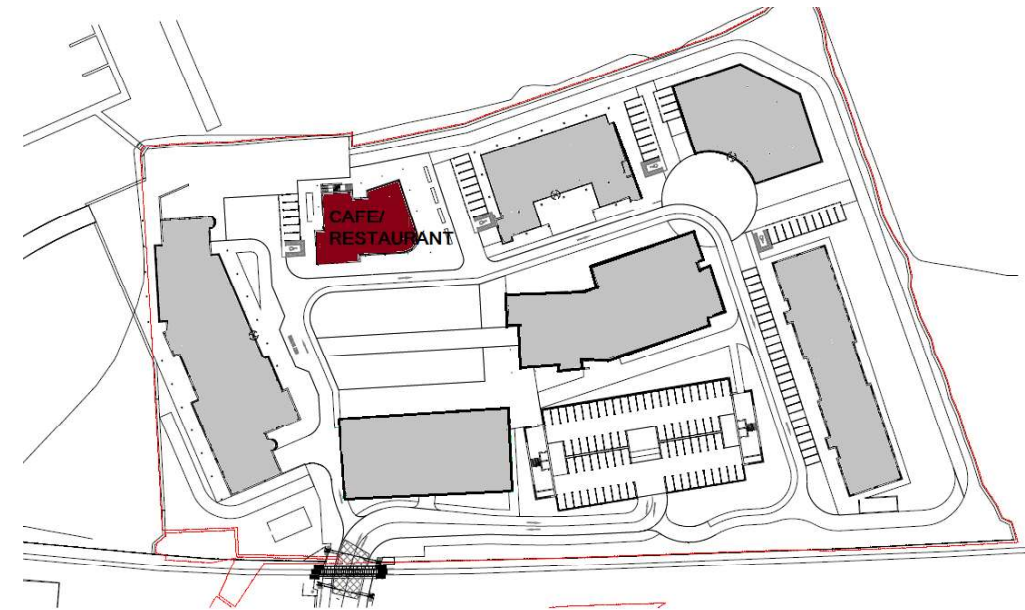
Site Key Plan Indicating the Café, Retail and Restaurant Building Location
